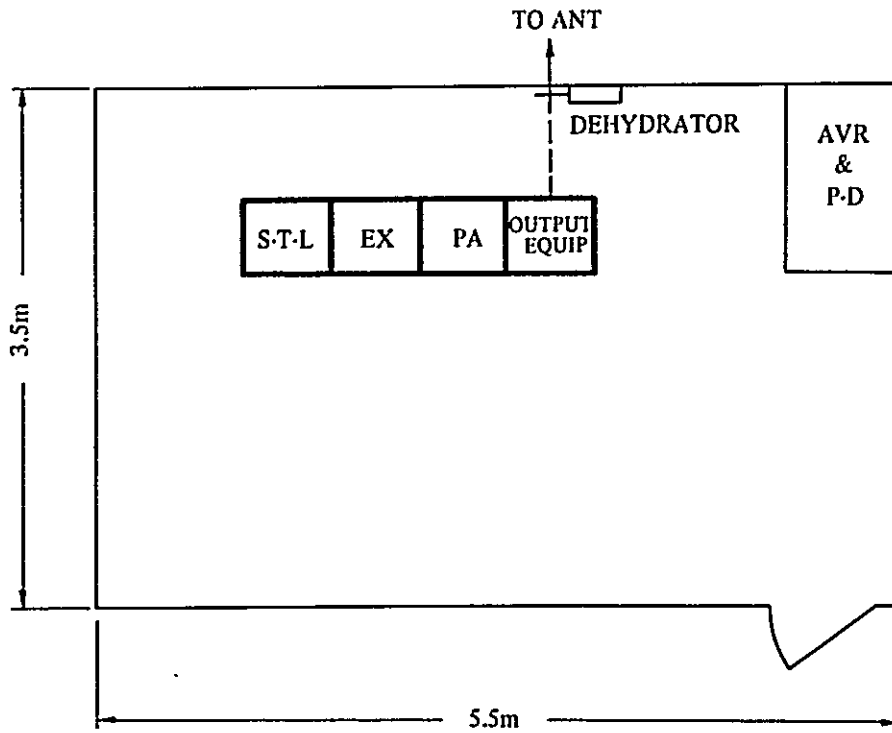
Floor Layout of 300W TV Transmitting Station
